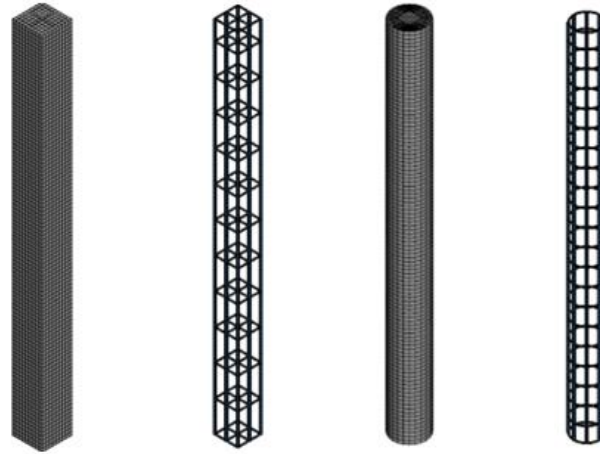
Detailing of the studied RC columns(a) square cross-section (b) circular cross-section
